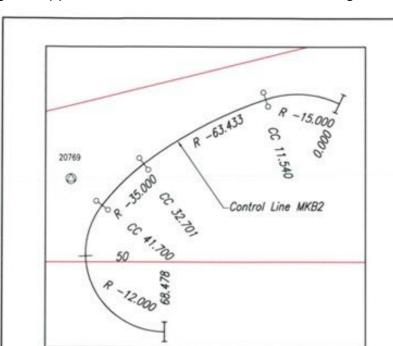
(d) – Intersection details and set-out tables – generic example 4
